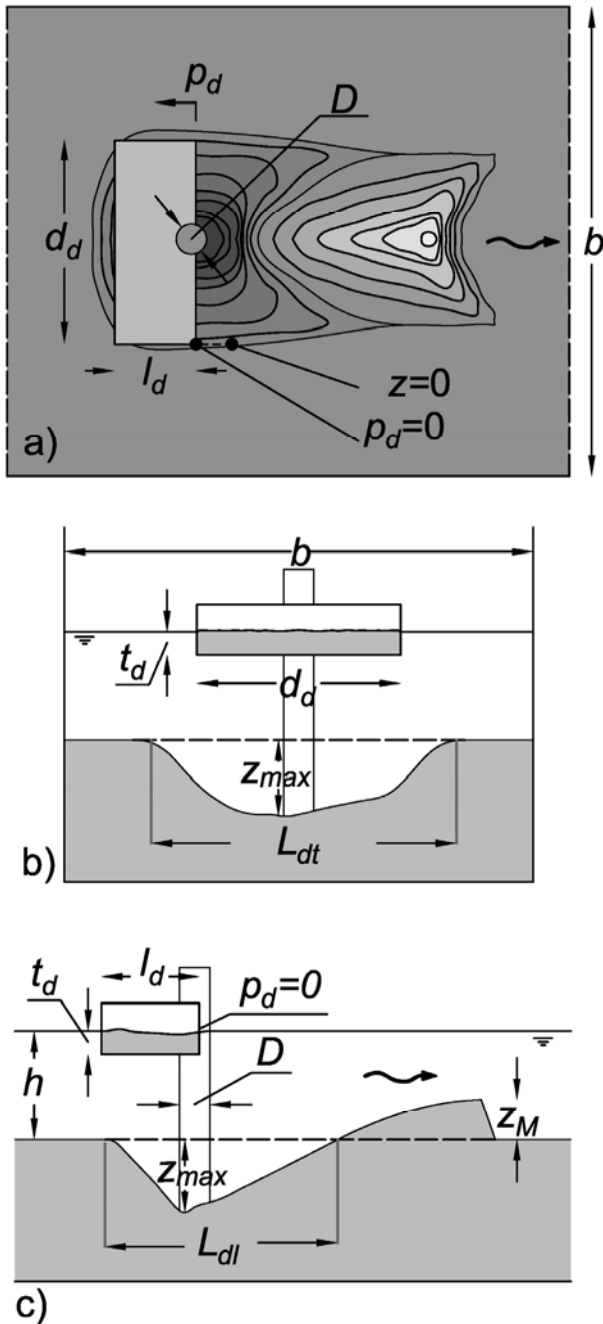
Sketch and notation: a) plan view, b) transverse section and c) longitudinal section.
